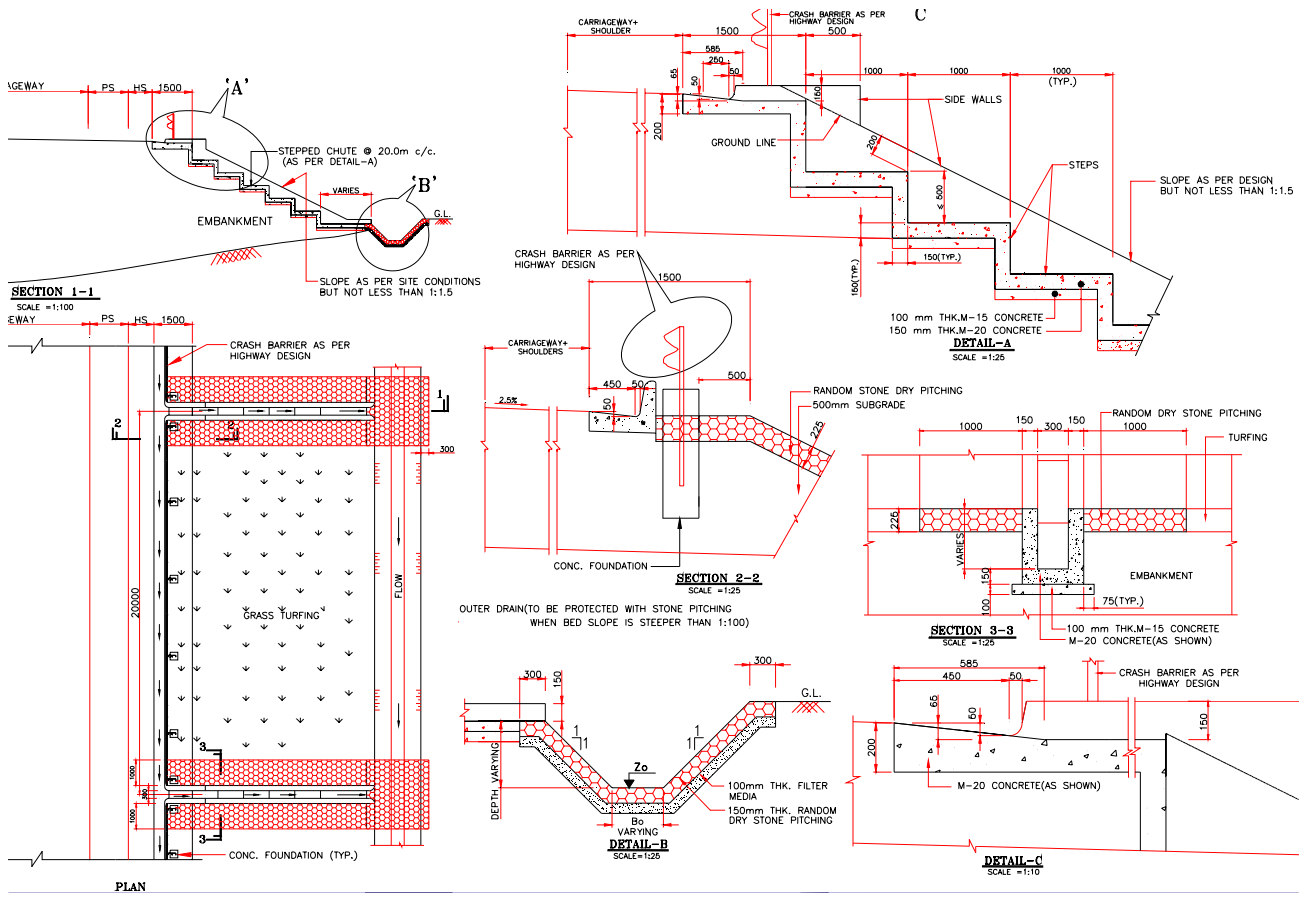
Showing Details of Stepped Type Drainage Chutes in High Embankments
